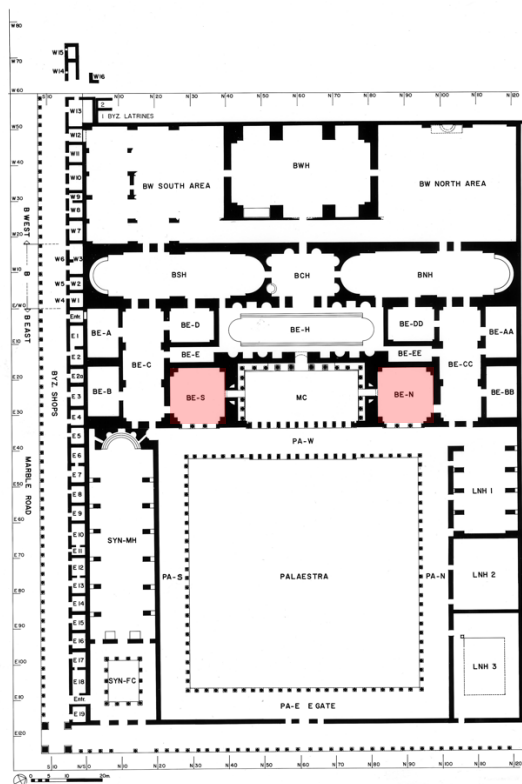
Plan of the Sardis Bath-Gymnasium Complex with Rooms BE-N and BE-S indicated in red.
